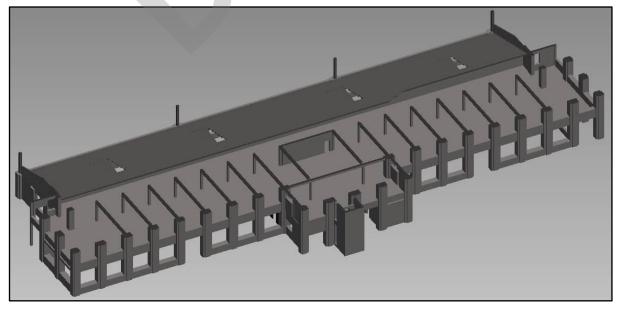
Cutaway showing beams, walls, and columns at the first floor level at GNS
